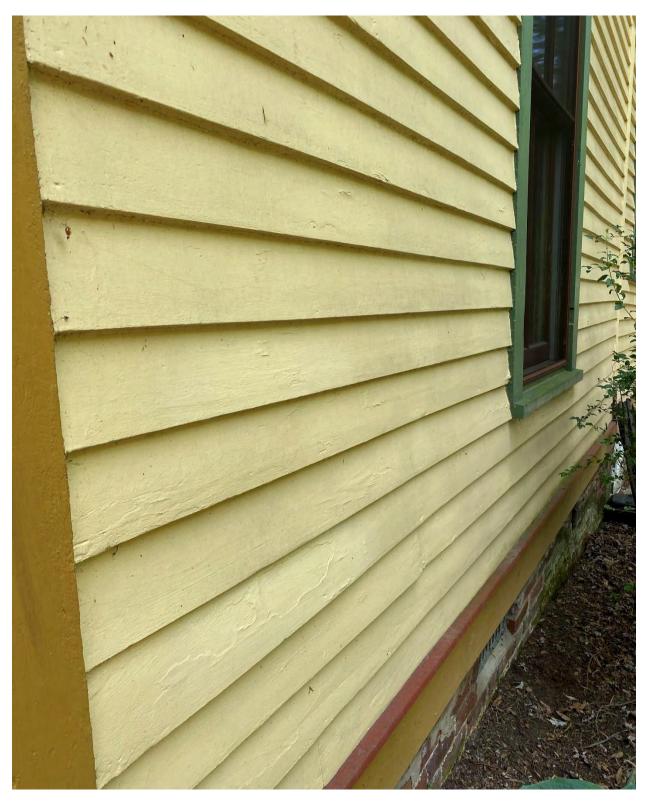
924 Carr St wood clapboard siding will cover reduced window opening
